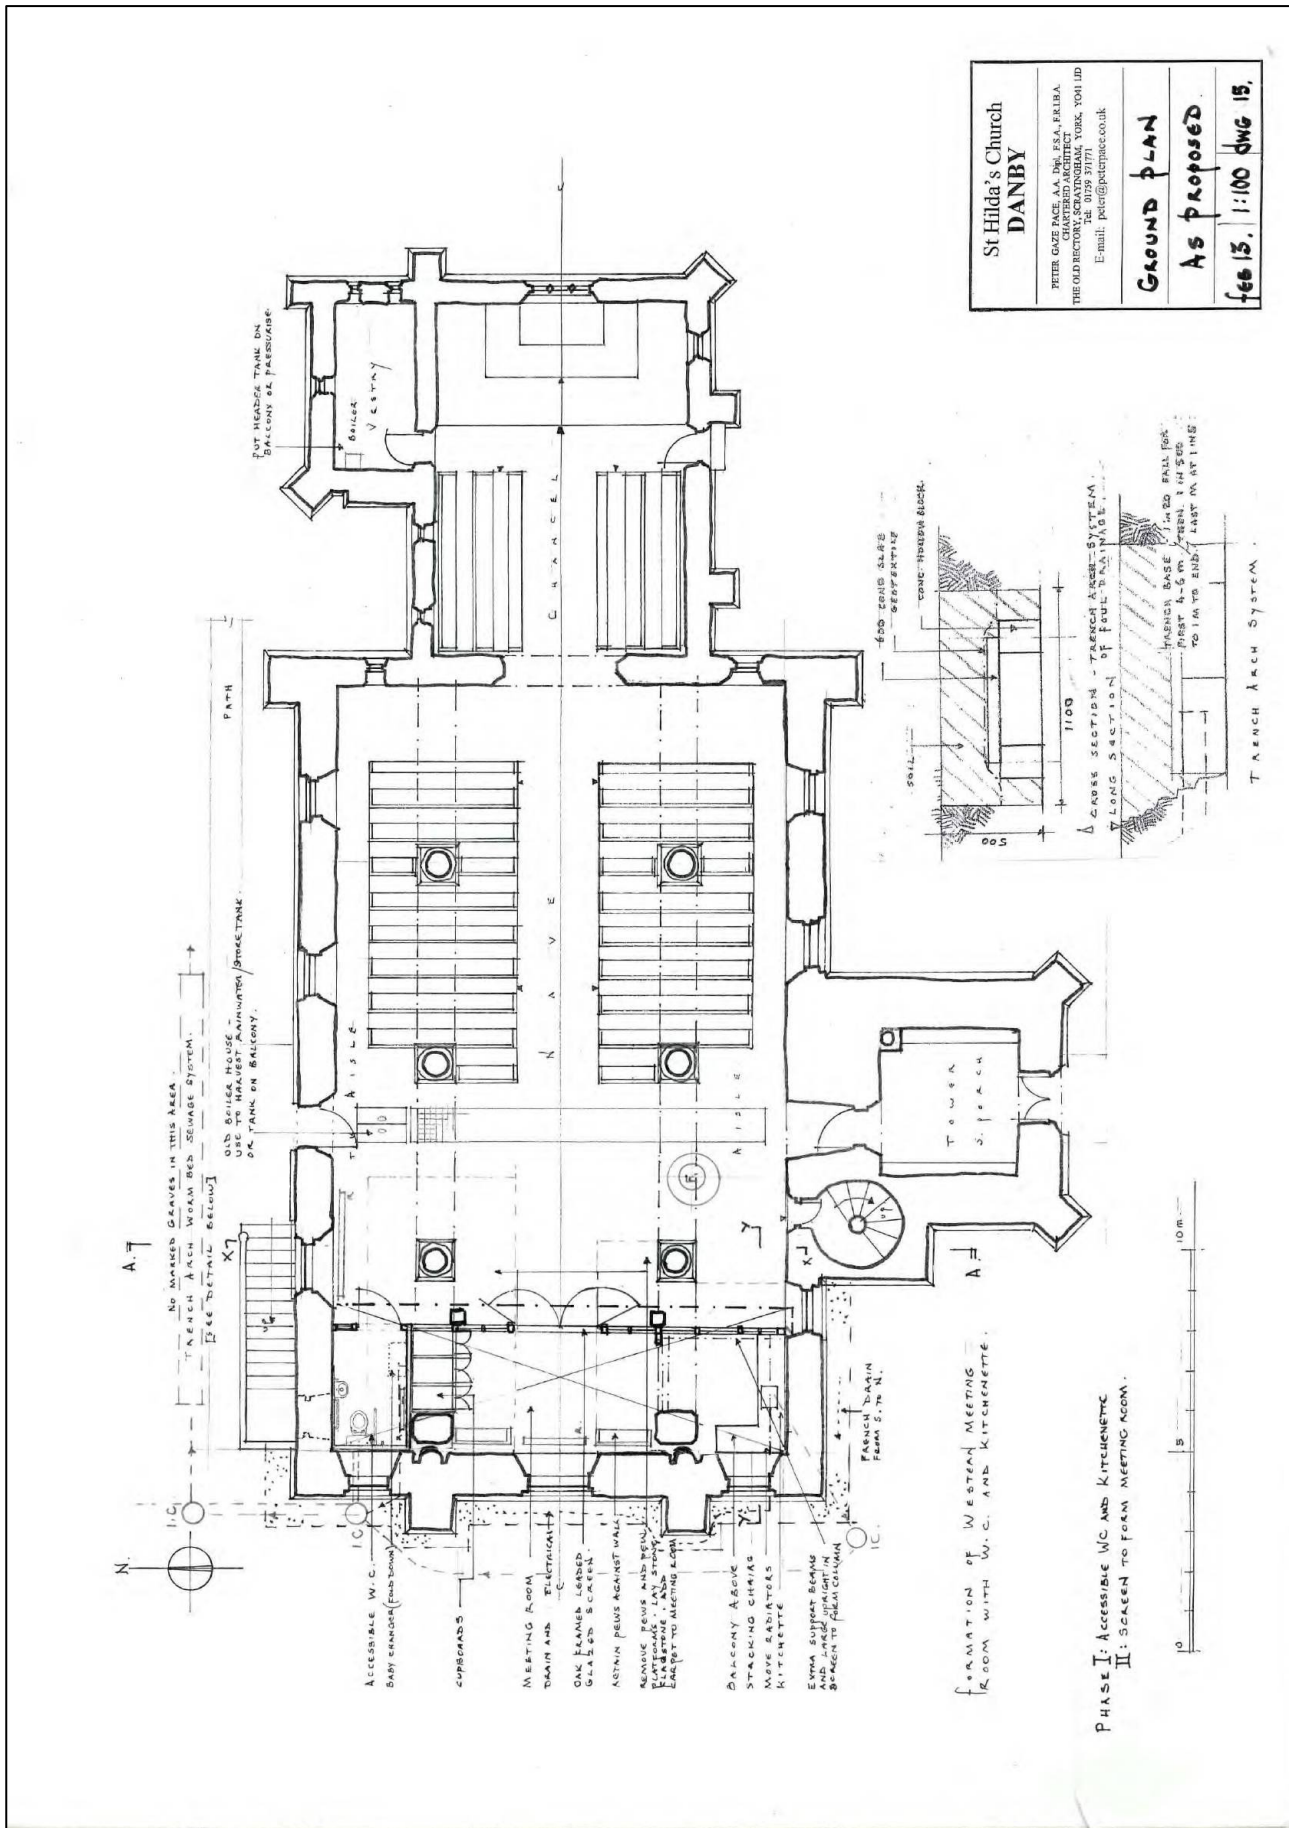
DEVELOPMENT PROPOSALS (Plan provided by Peter Pace Architect)
